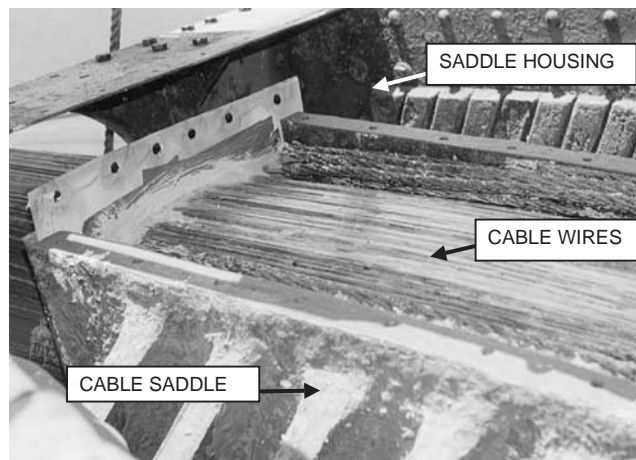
Tower saddle opened for cable inspection.
